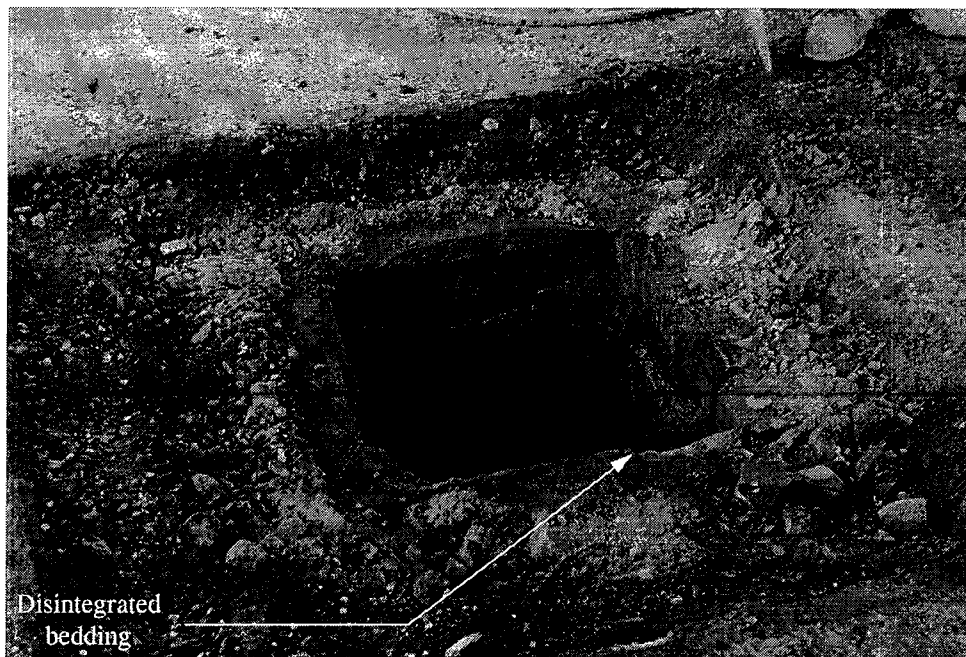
Bedding material condition of north manhole after failure
